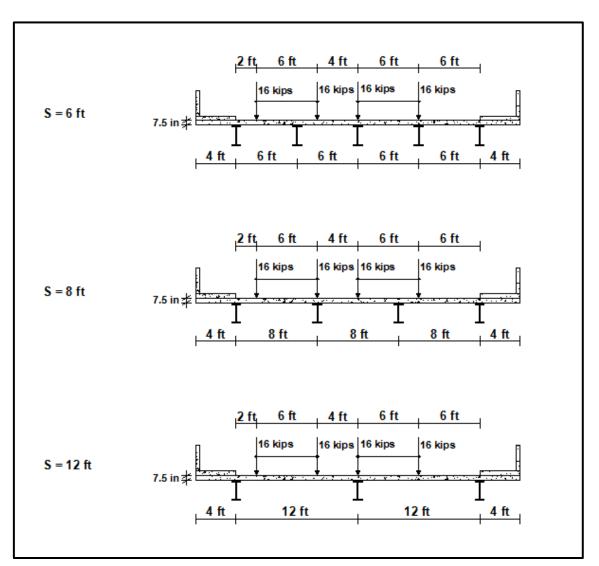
Typical Bridge Cross-section - Case of Two Lanes with Sidewalks and Railings on Both Sides
